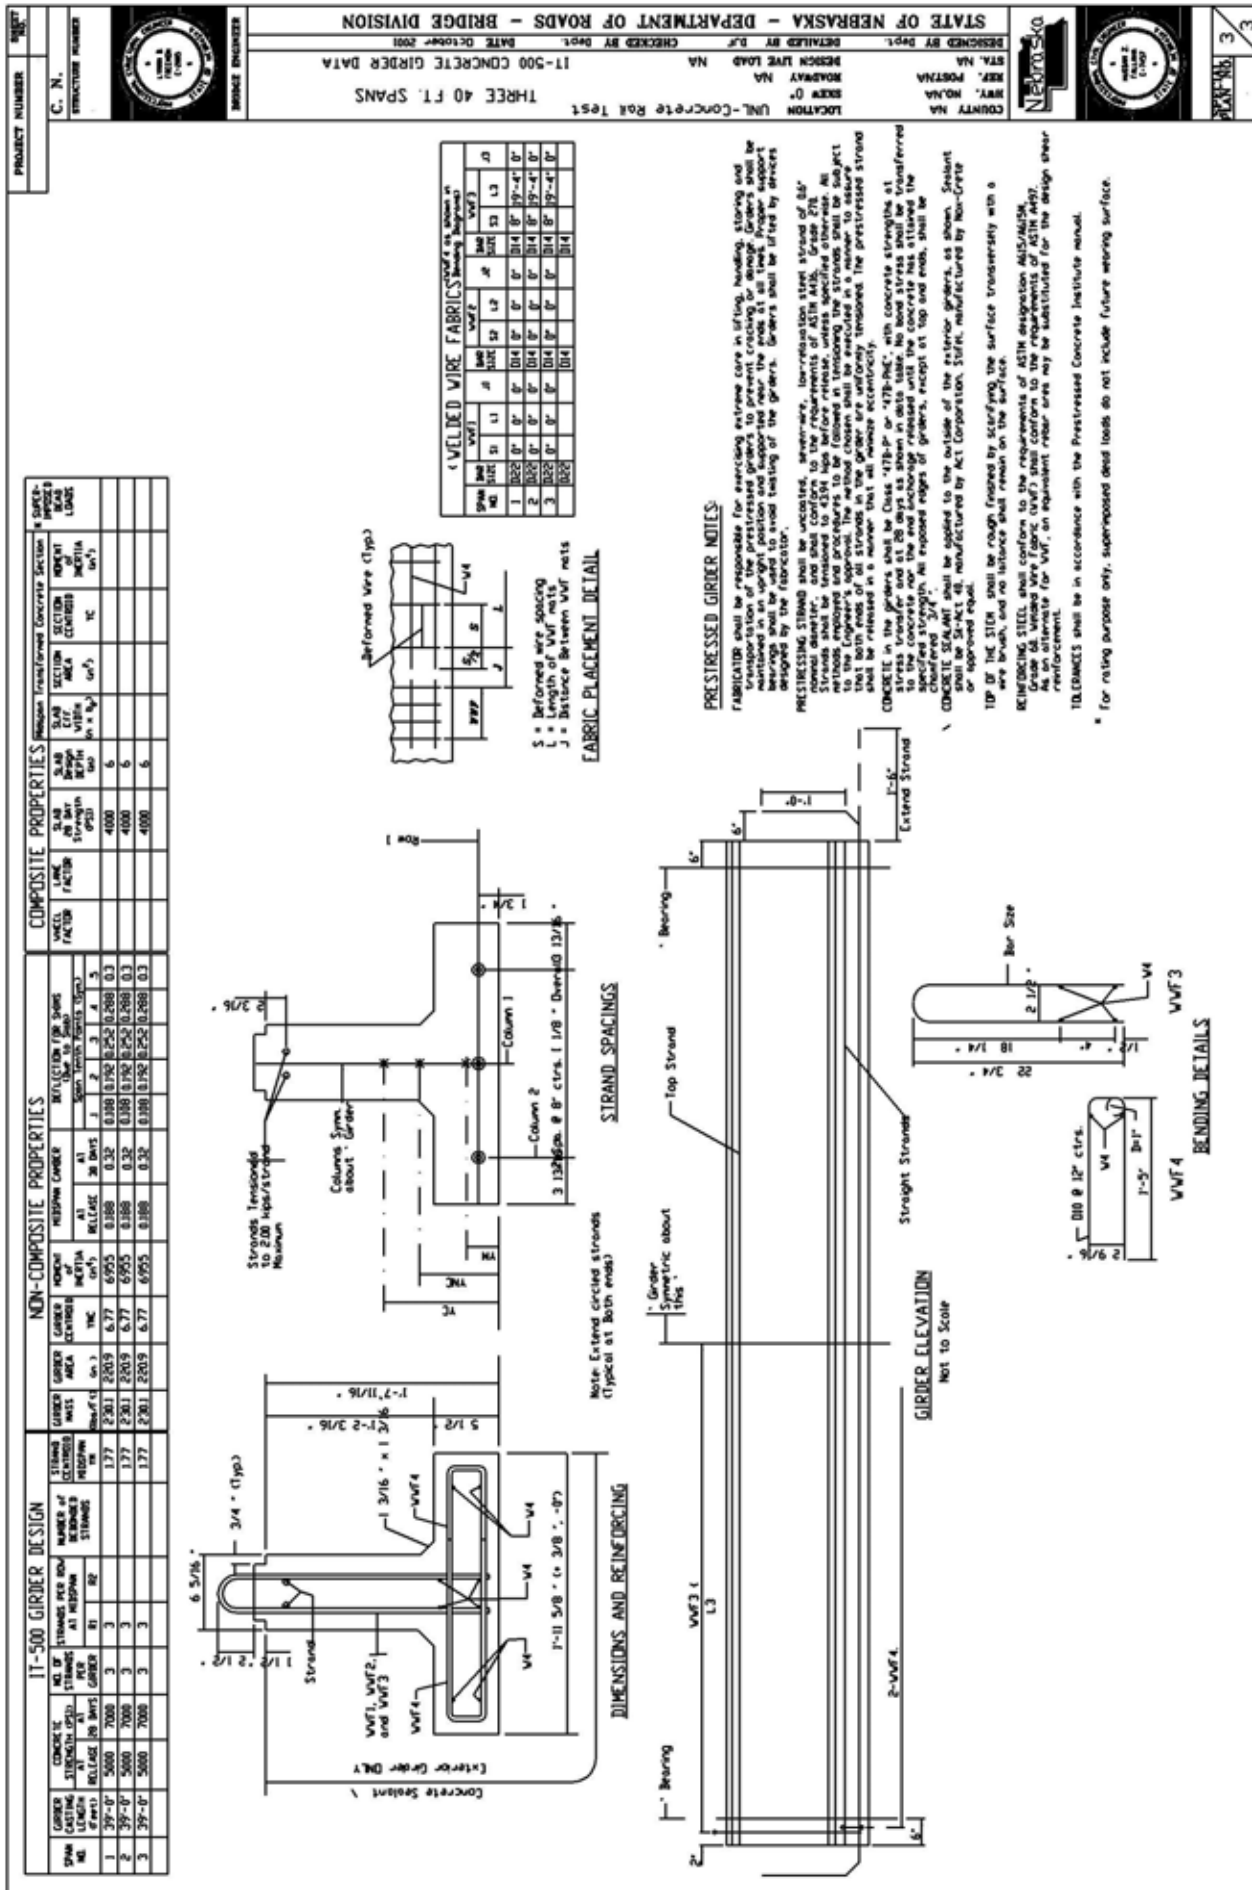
NDOR's Inverted Tee Standard Plans (English)
